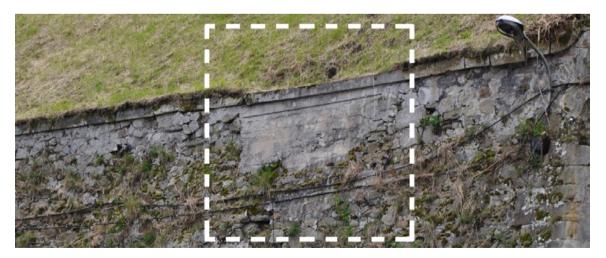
Photograph showing secondary concrete filling of the face of the wall (2017) – authors' own photograph
